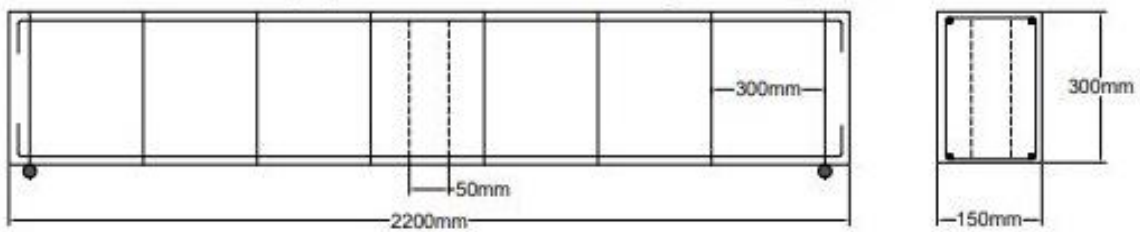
(c). Illustration of test beams (B6 and B8) with opening and 50mm diameter PVC pipe placed vertically at midspan
